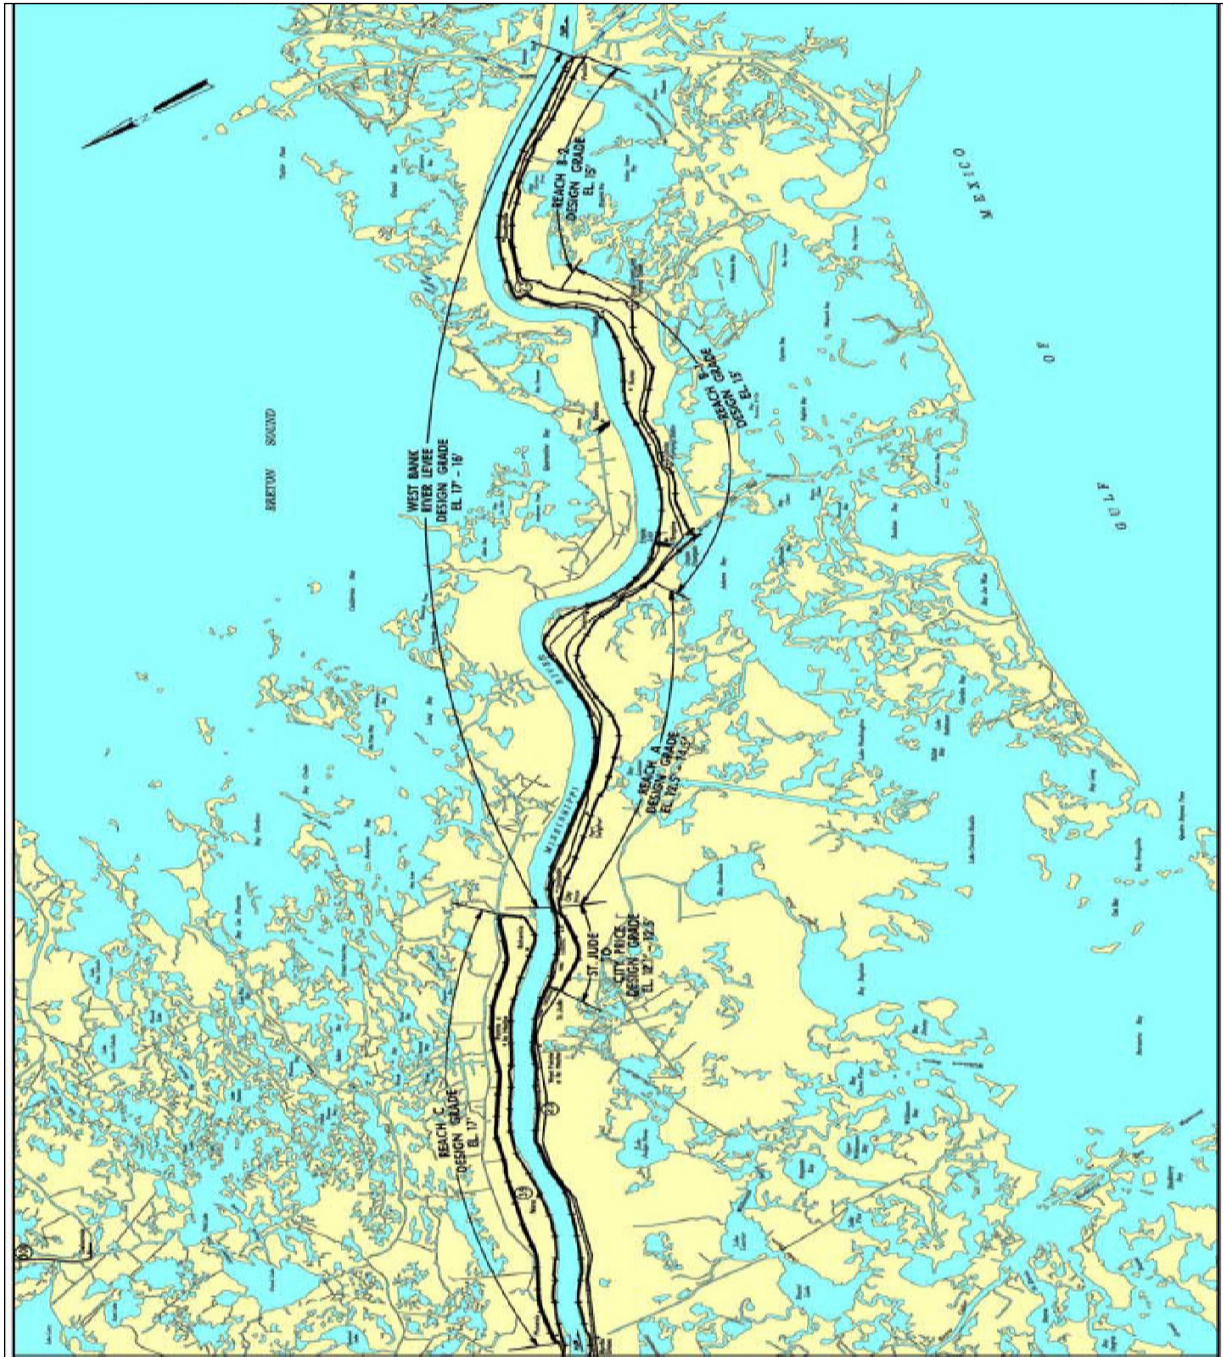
New Orleans to Venice. LA Hurricane Protection Project
